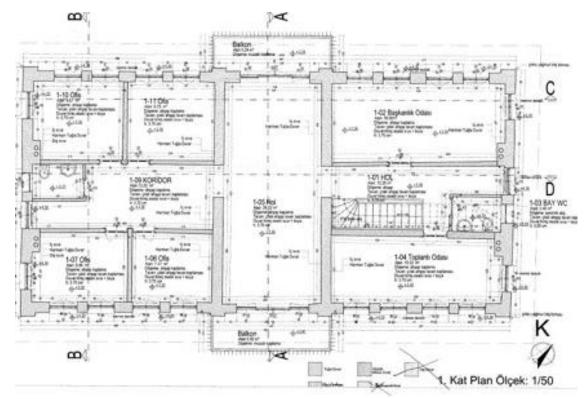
First-Floor Plan, [Bozdağ Architecture Company] [25]
